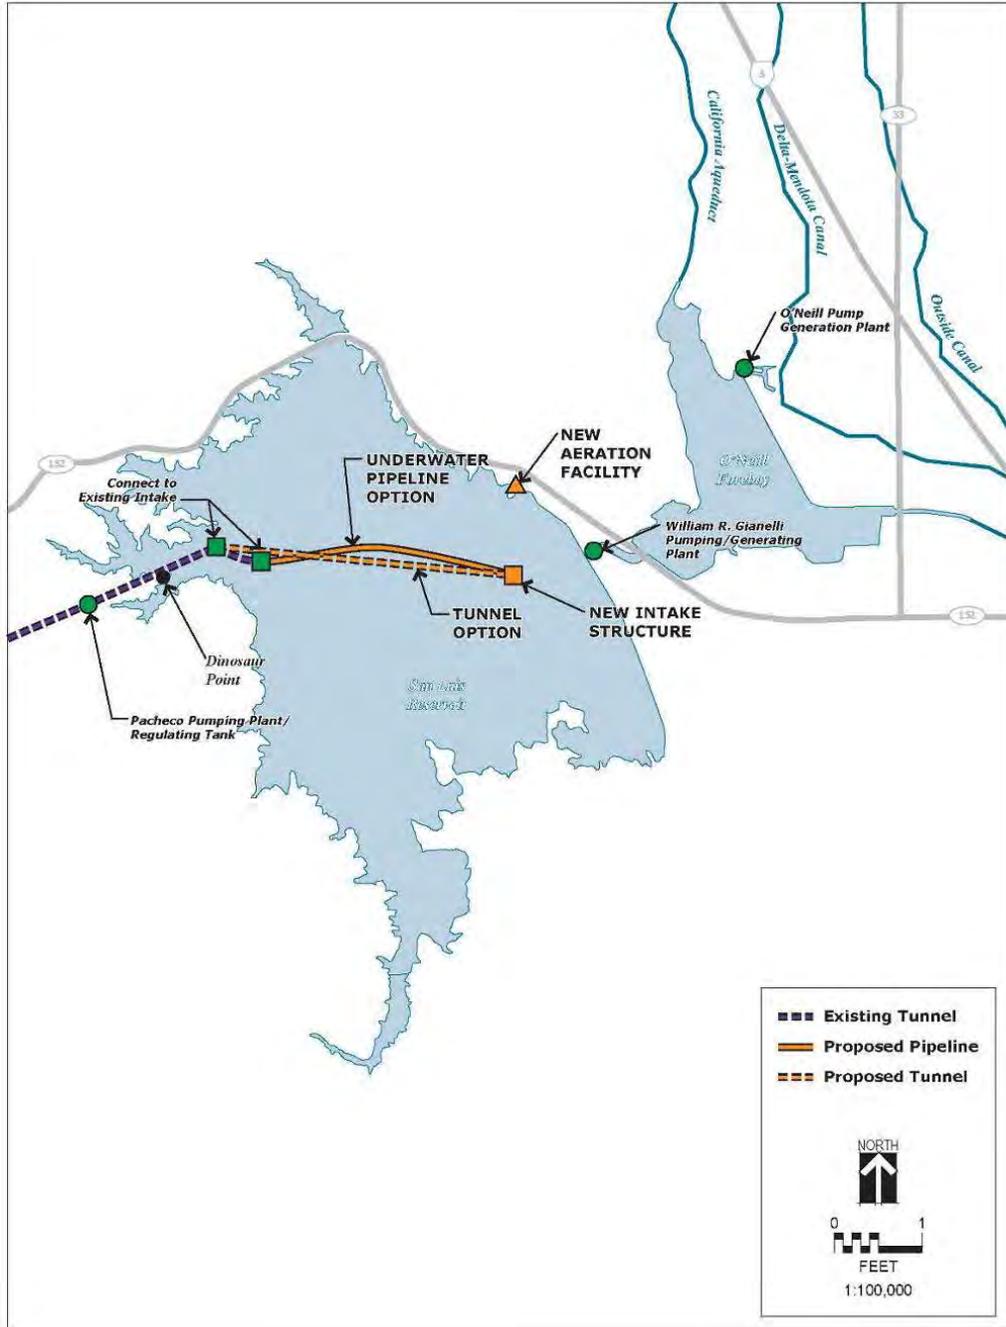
Pipeline and Tunnel Alignment for the Lower San Felipe Intake Alternative Plan
